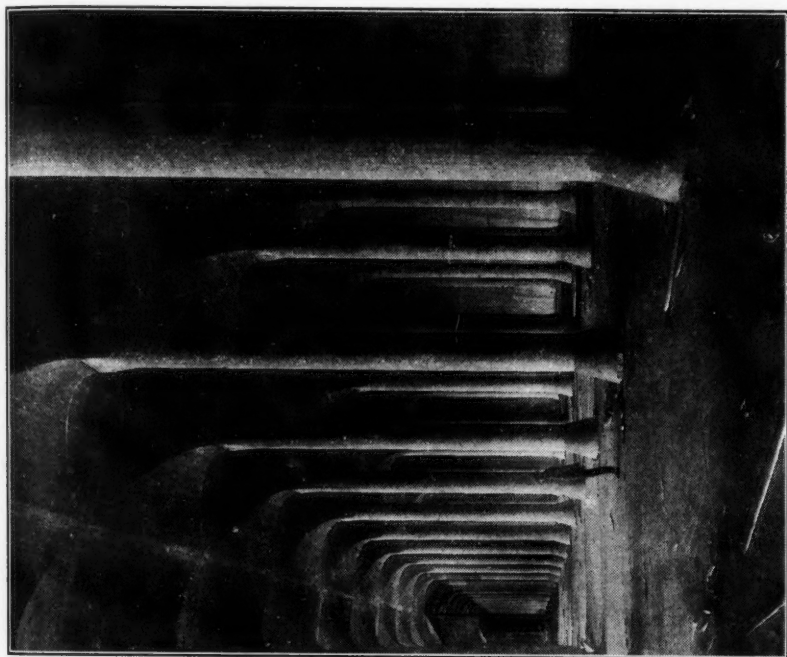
INTERIOR VIEW OF BALDWIN RESERVOIR.
